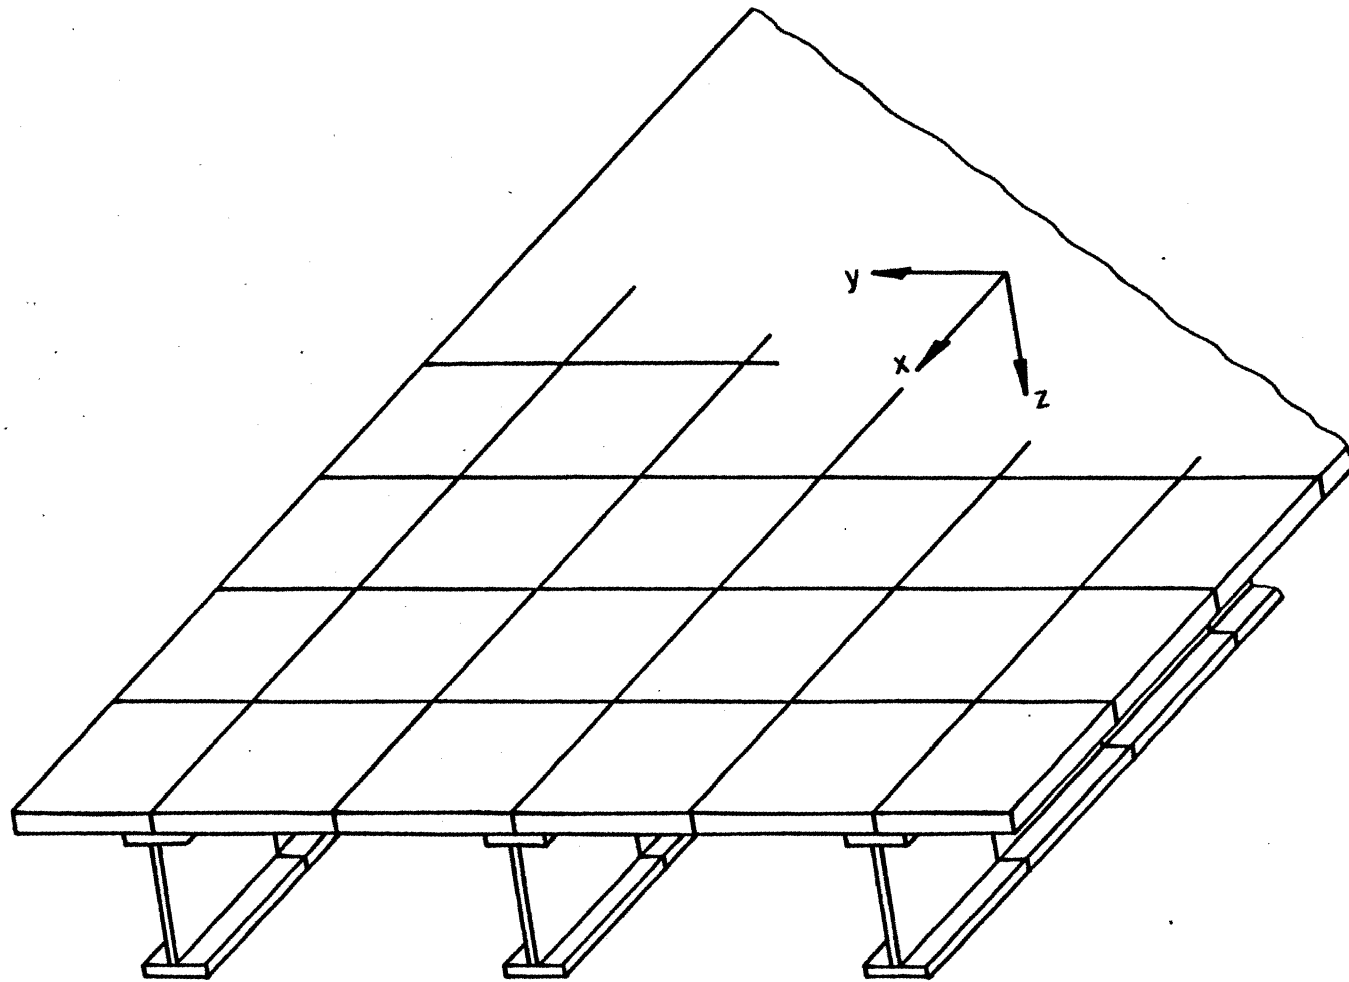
Typical Slab-Girder Highway Bridge Finite Element Discretization
